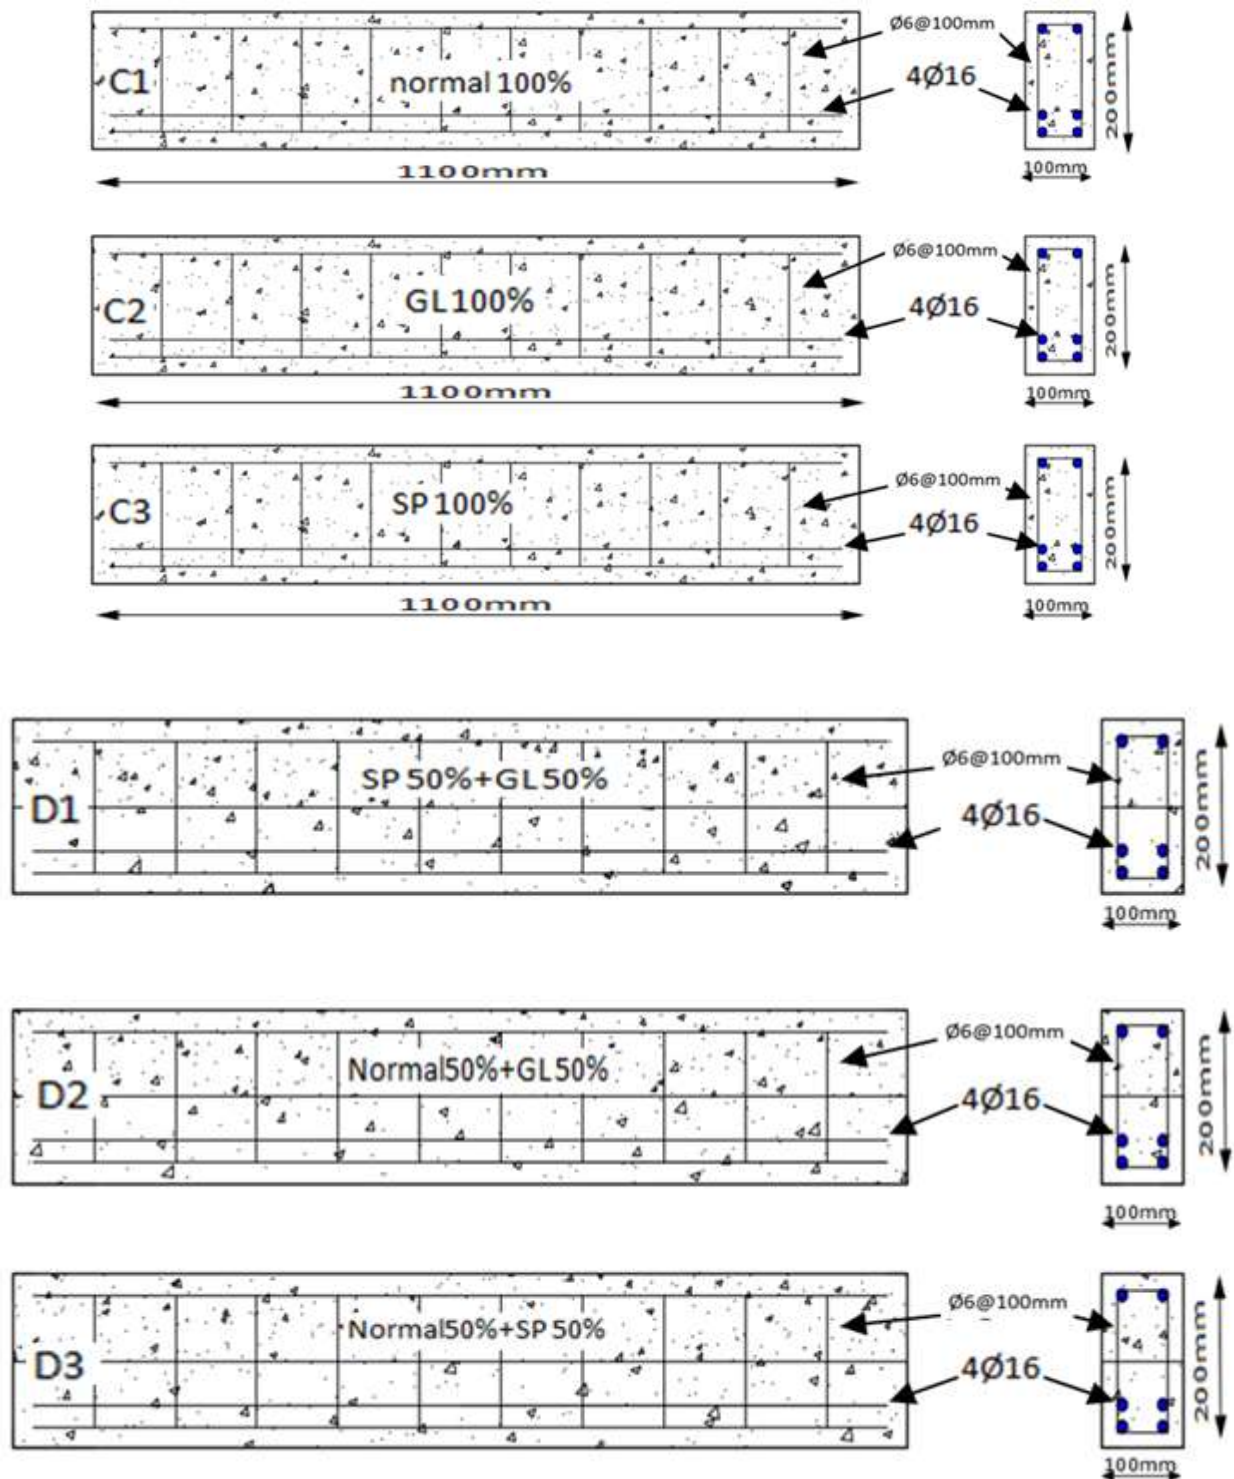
Each beam was designated in a way to refer to concrete type and steel bar reinforcement
